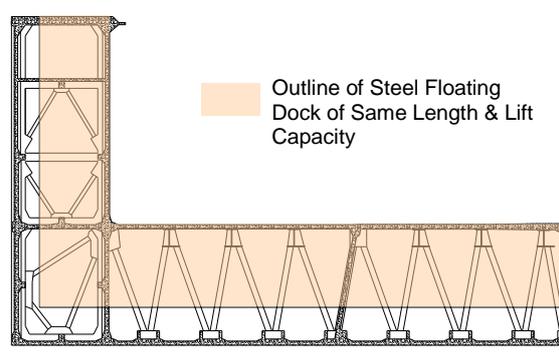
Half Cross Section of 100,000 TLC Prestressed Concrete Floating Dock with outline of steel dock of same lift capacity superimposed.
